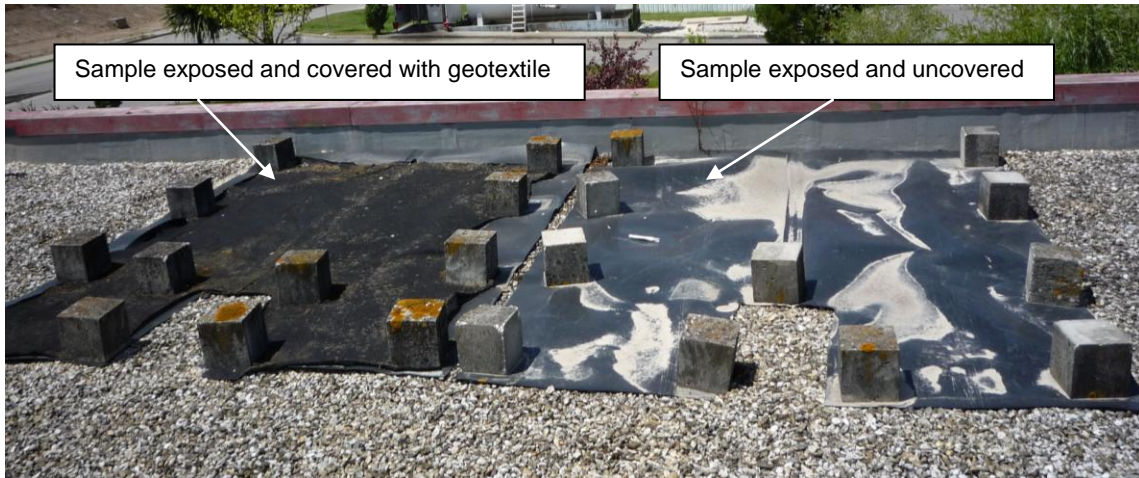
Example of a geomembrane sample exposed to weather conditions (landfill site 4)
